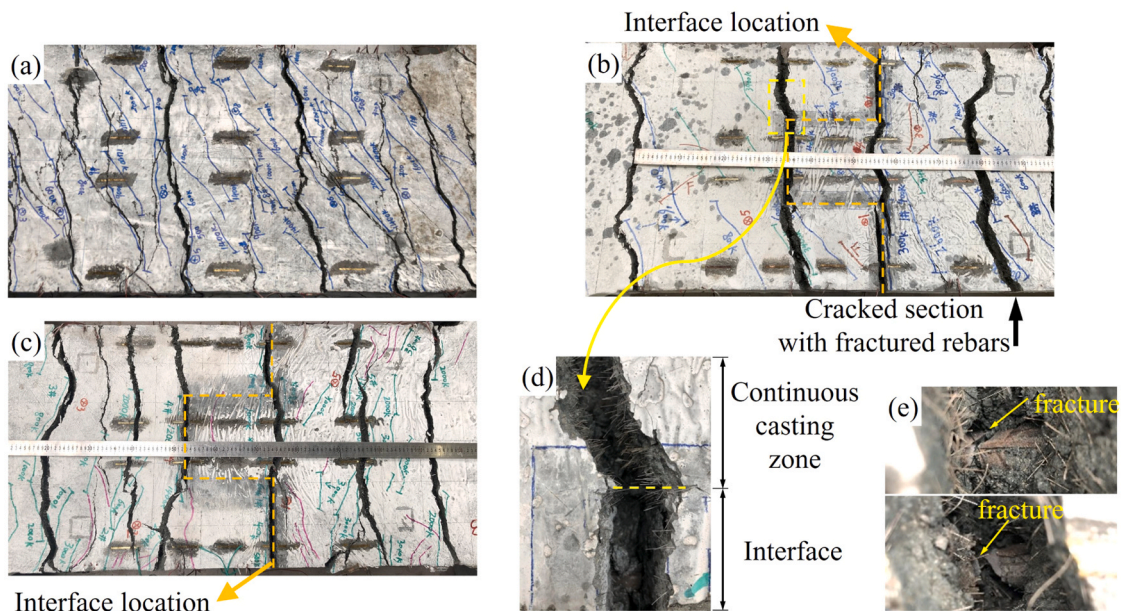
Cracking patterns and failure modes: (a) SN-1; (b) SN-2; (c) SN-3; (d) fracture surface comparison between continuous UHPC and interface; and (e) fracture of rebars in specimen SN-2.
